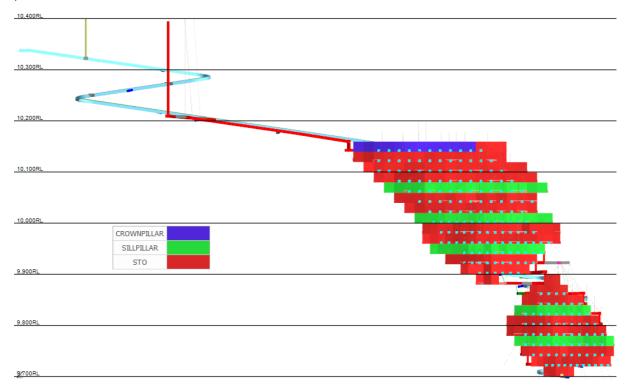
Stopes, Sill Pillars and Crown Pillars – Cross Section View
